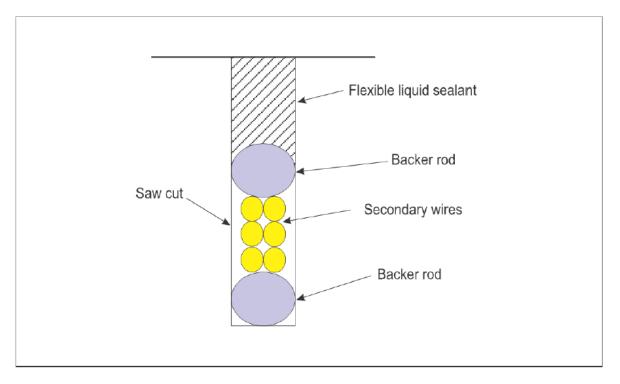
Secondary wireway saw cut for in-pavement lights
